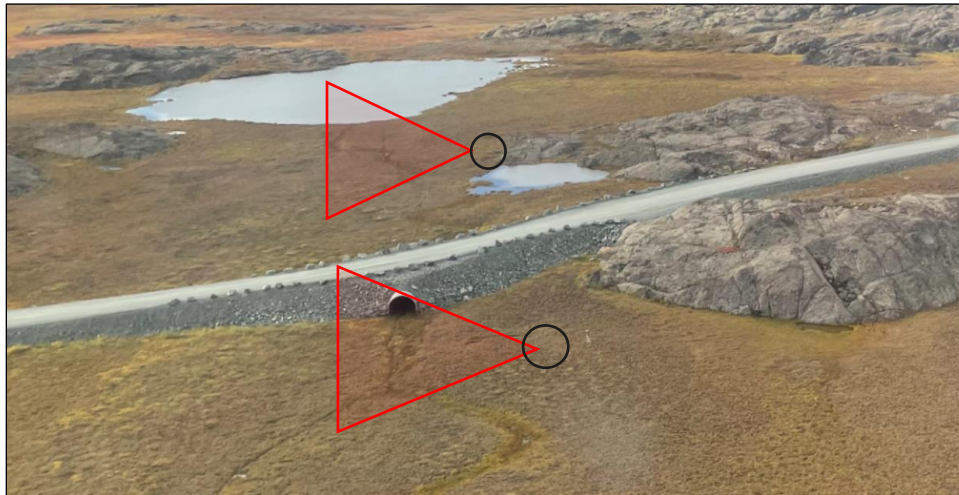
Culvert wildlife cameras and their approximate field of views, facing south on either side of Windy Road. August 2023.
